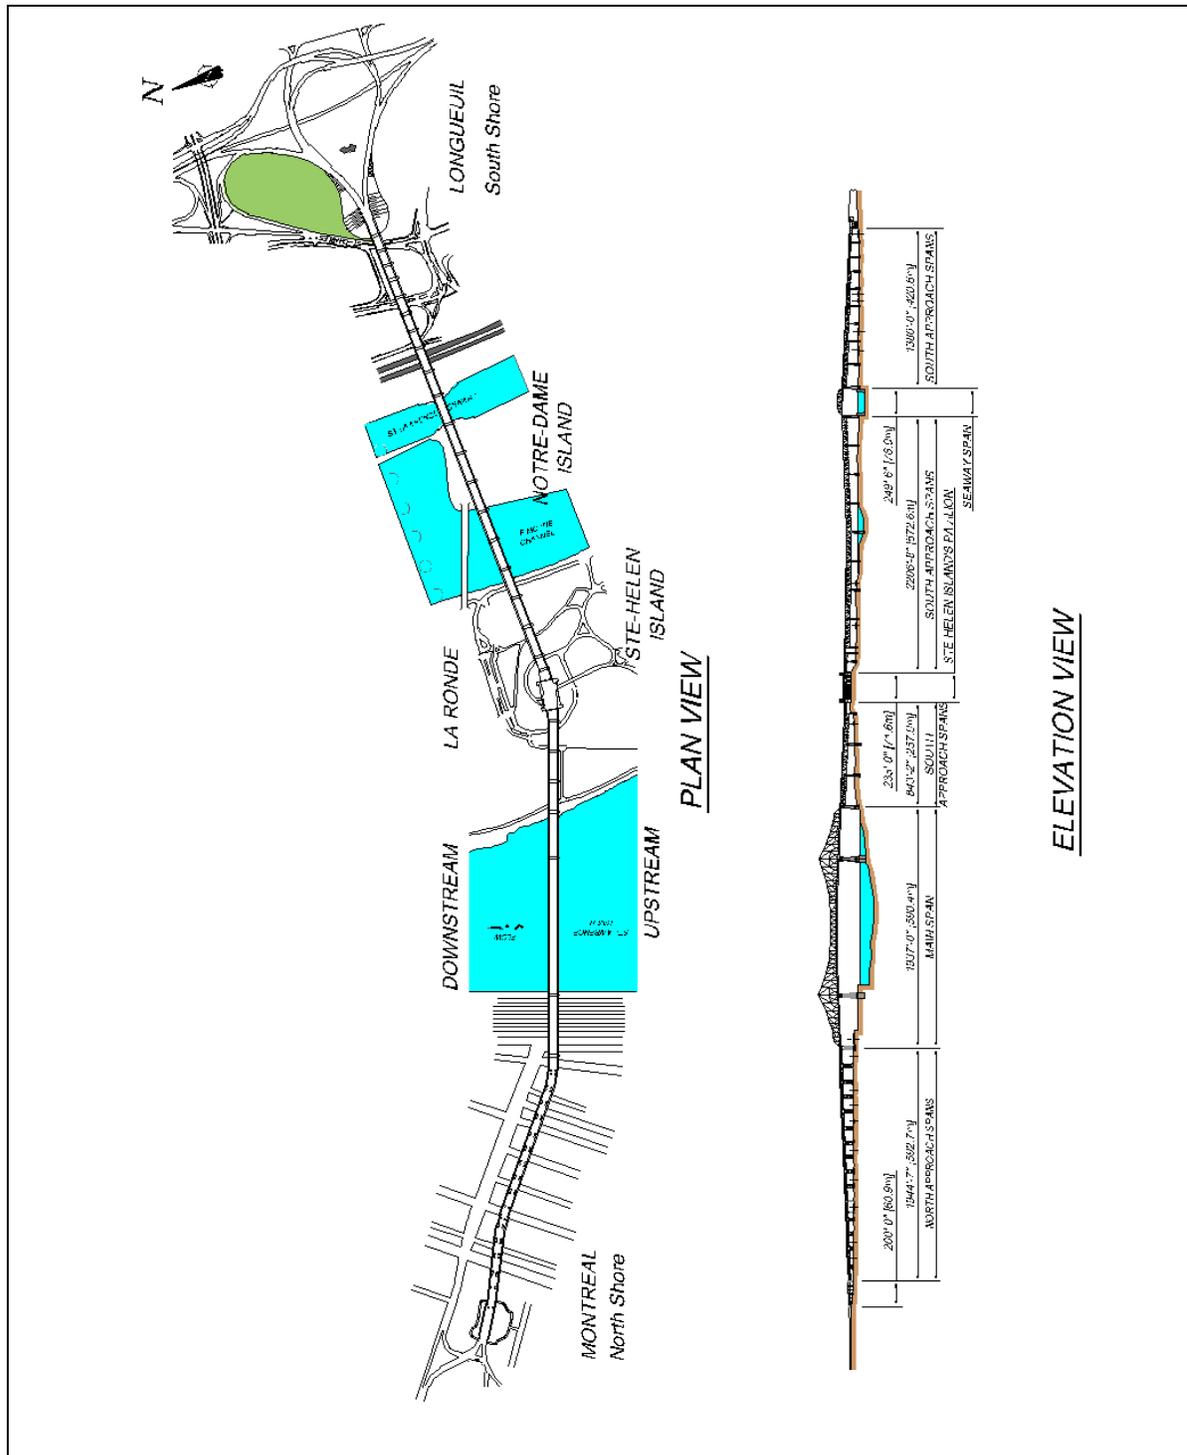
General Layout of Bridge Showing Plan and Elevation Views
